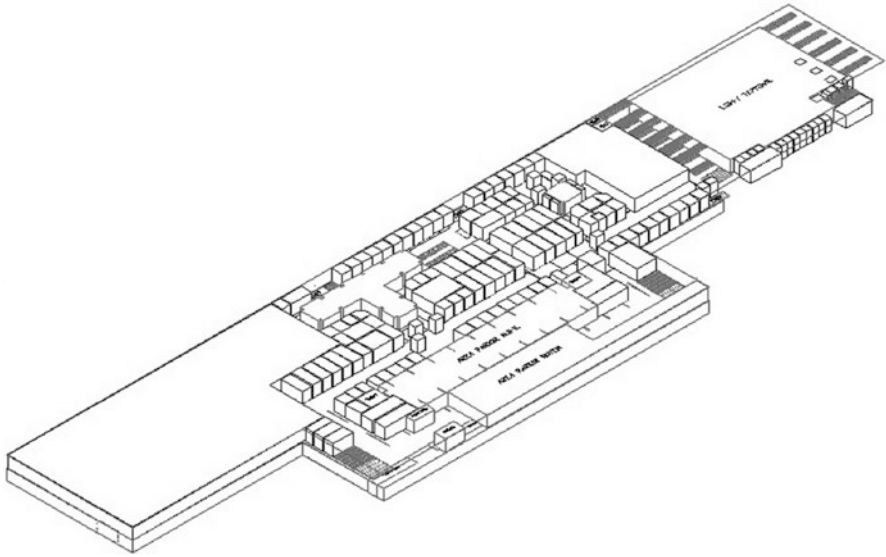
Union of 3D building shape at B1 and B2 floors
